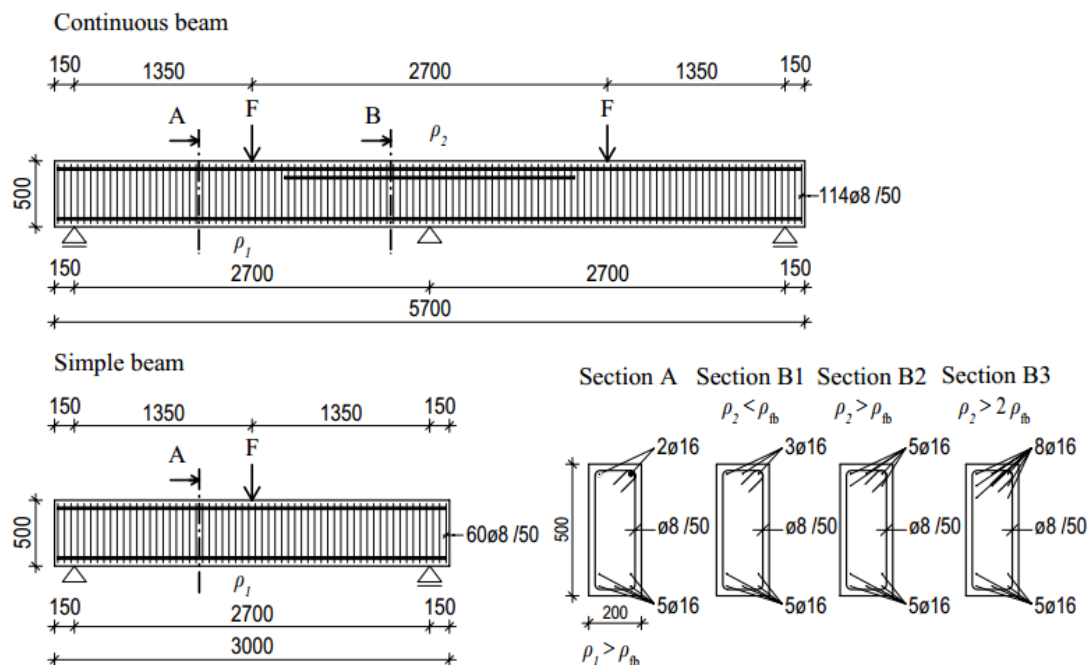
Geometry and reinforcement details of tested beams (dimensions in mm)
